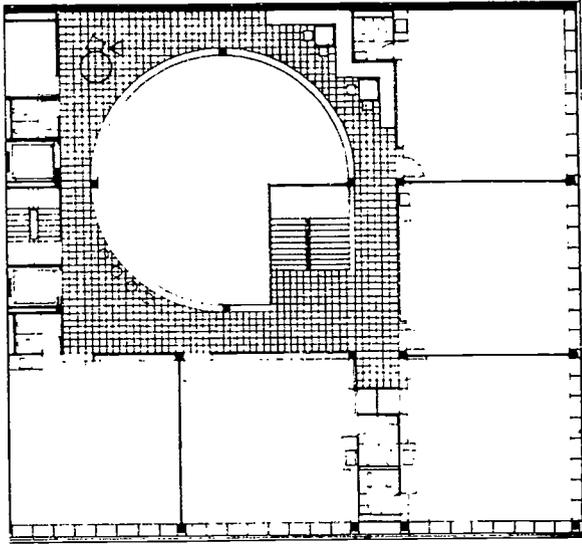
Martin della Paolera, project for Washington Heights, plan of typical floor showing atrium in upper left
